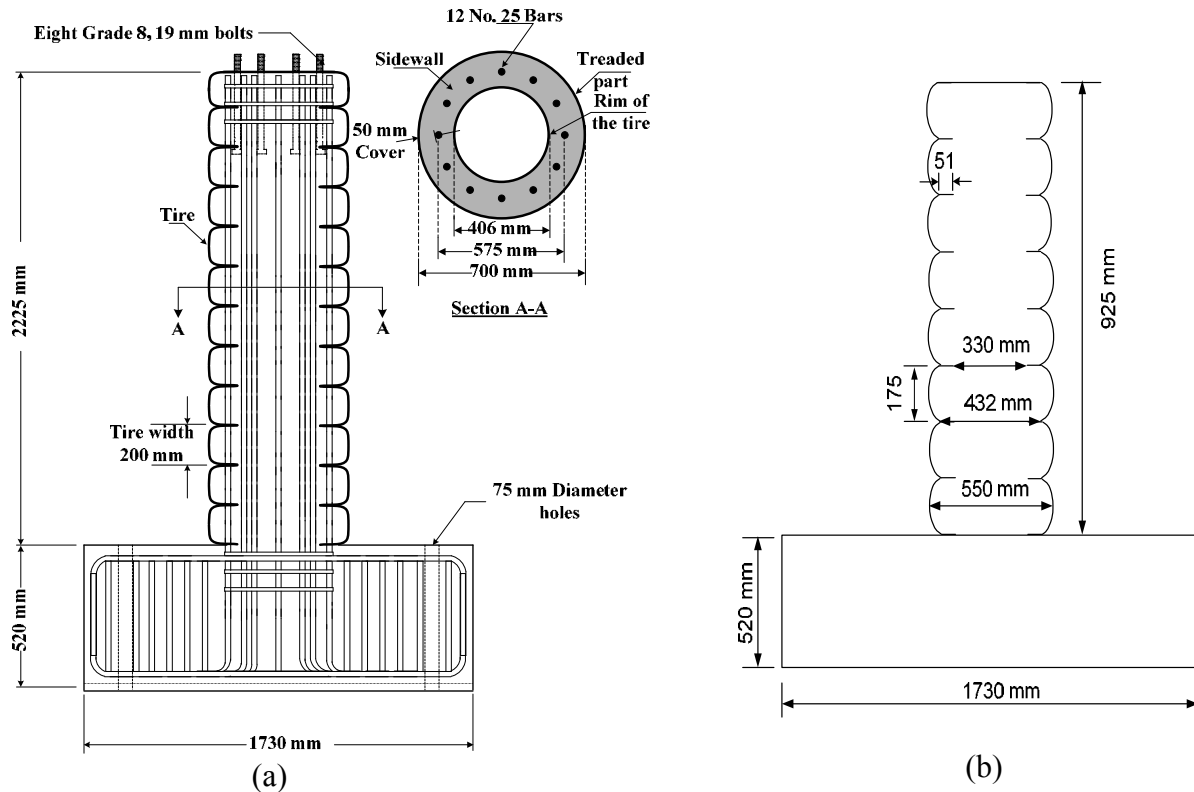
Geometric Details of Test Specimens; a) Column TC-7 and, b) Column TC-12
